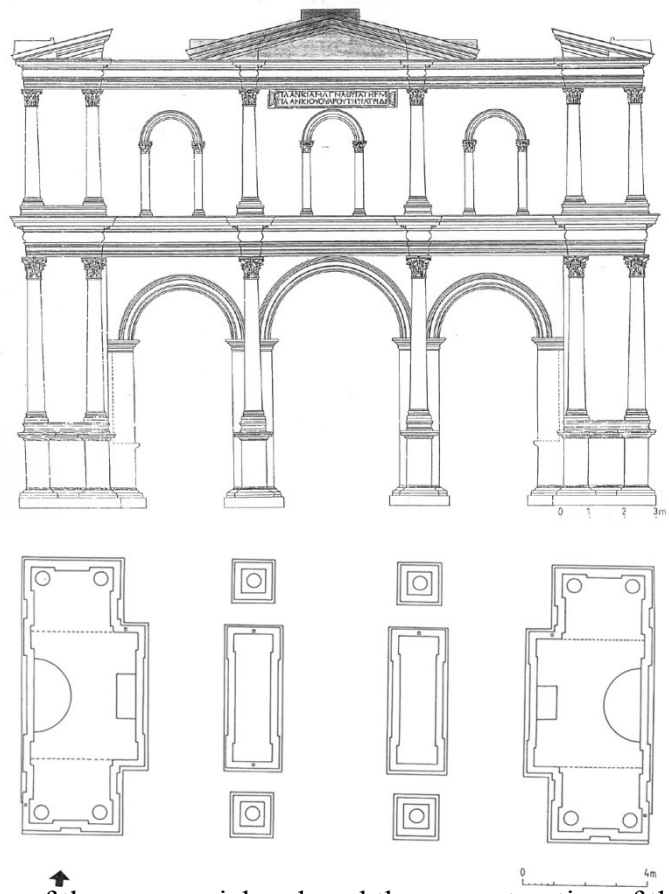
Plan of the ceremonial arch and the reconstruction of the south façade
